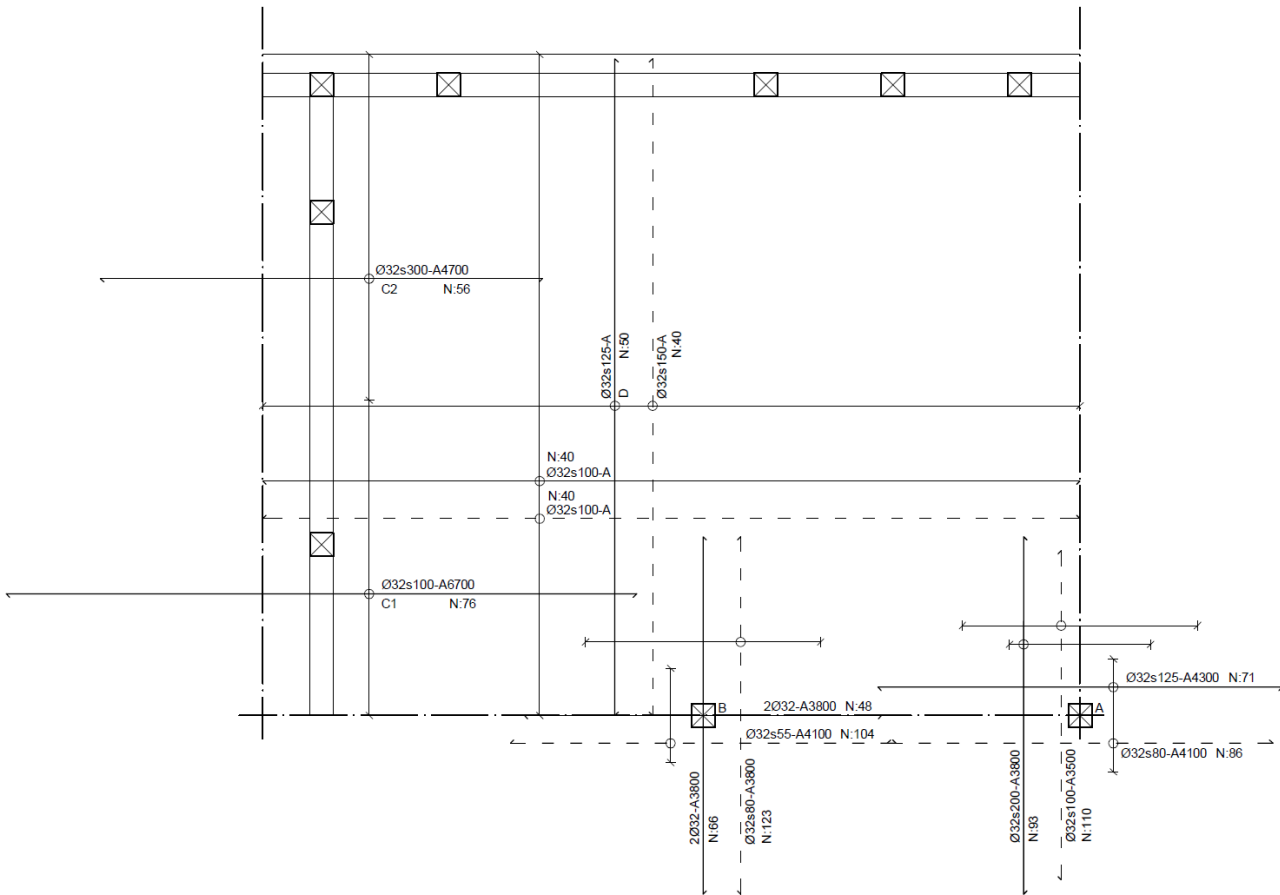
Needed arrangement of GFRP reinforcement with regard to the need in the serviceability limit state.
